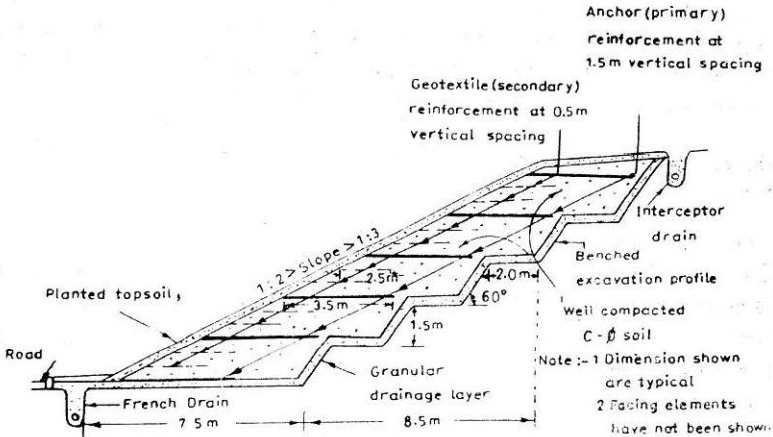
Showing cross-section of a typical failed earth slope reinstatement proposal using Combined System of soil reinforcement.
